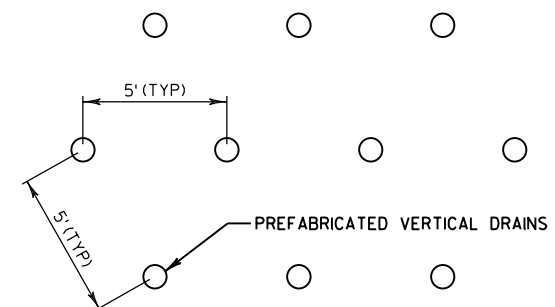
DETAIL FOR EARTHWORK MEASUREMENT AT FILL AREAS WITH PREFABRICATED VERTICAL DRAINS
